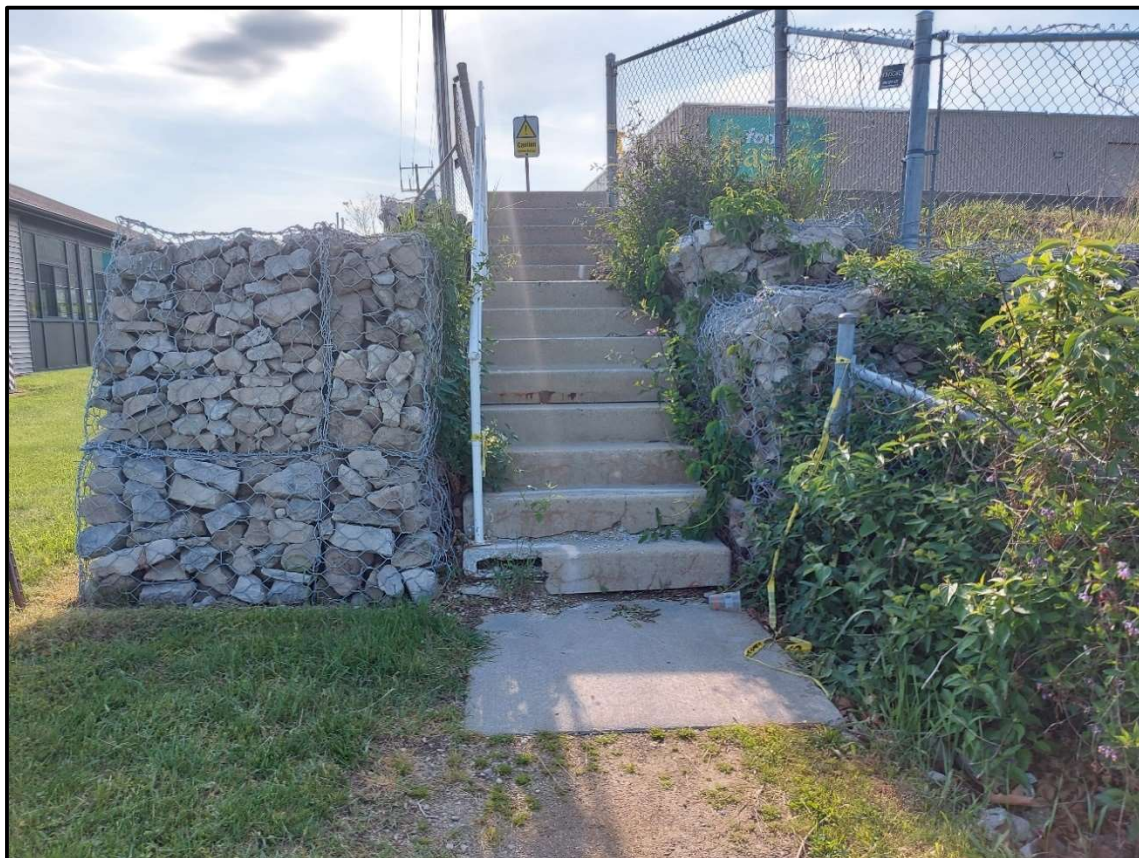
Damage to Step Connection from Commercial Plaza to East Trail
